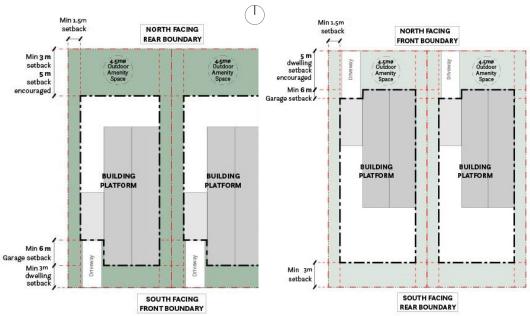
Typology 1a & 1b_Typical Boundary Setbacks Sketch
